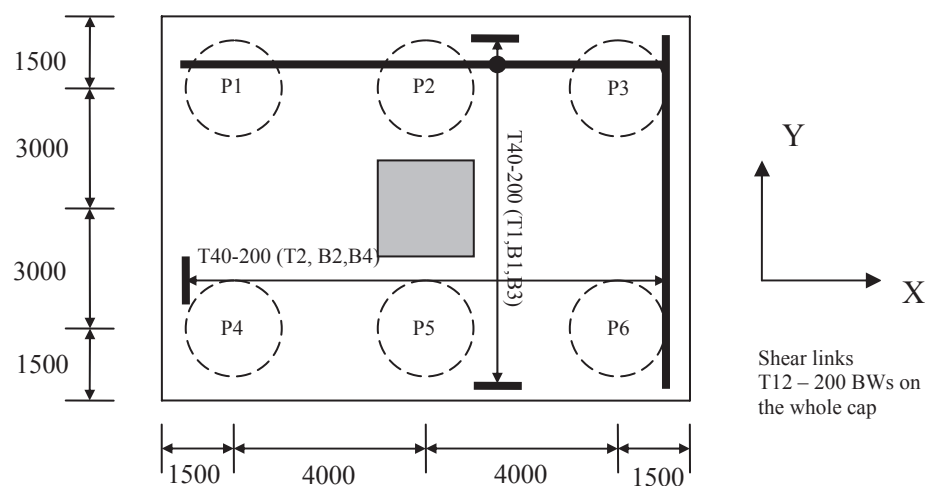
Reinforcement Design of Worked Example 12.1
